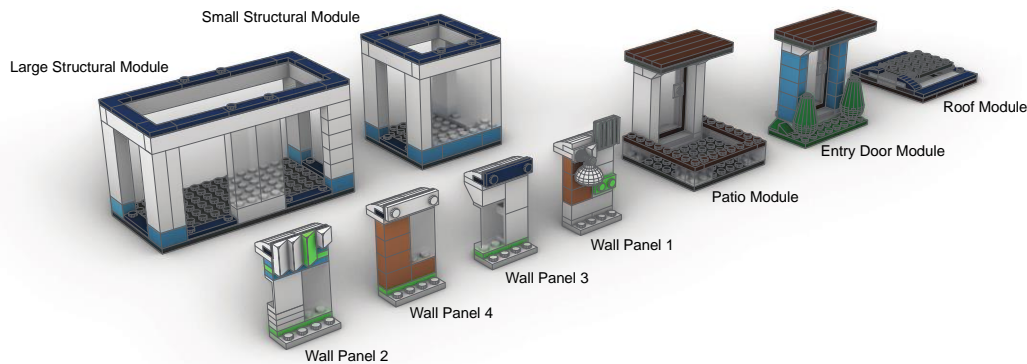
Method II required each team to build a LEGO project utilizing modular construction with a 3D design and a 4D project schedule
